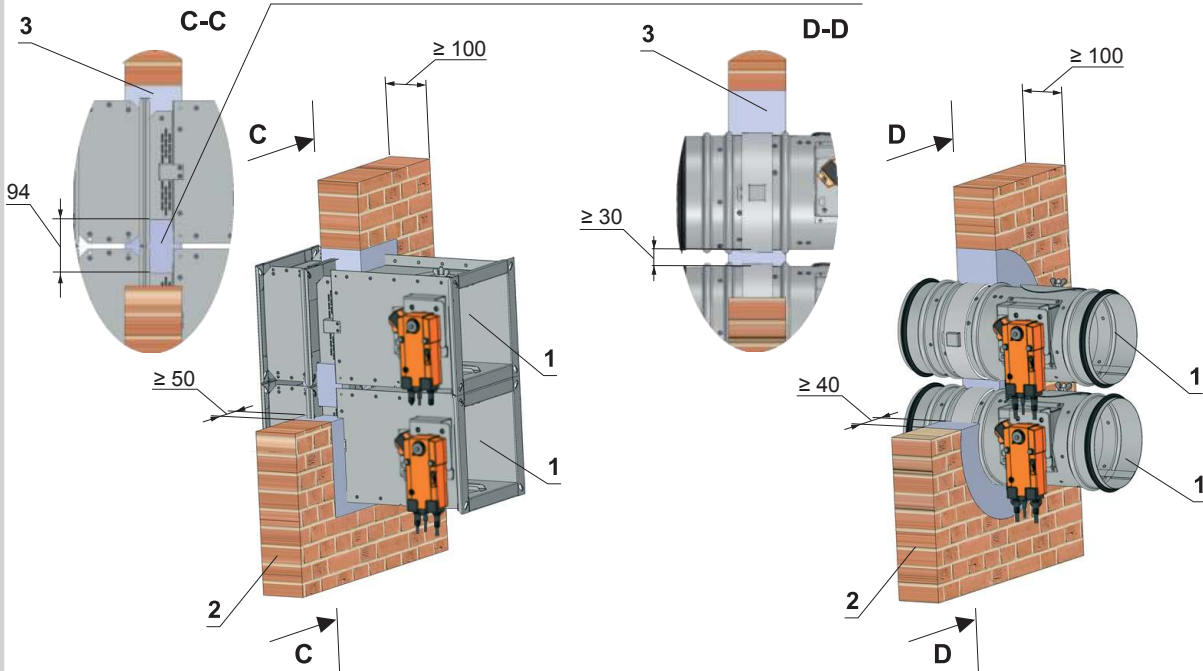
Solid wall construction - flange to flange - mortar or gypsum
